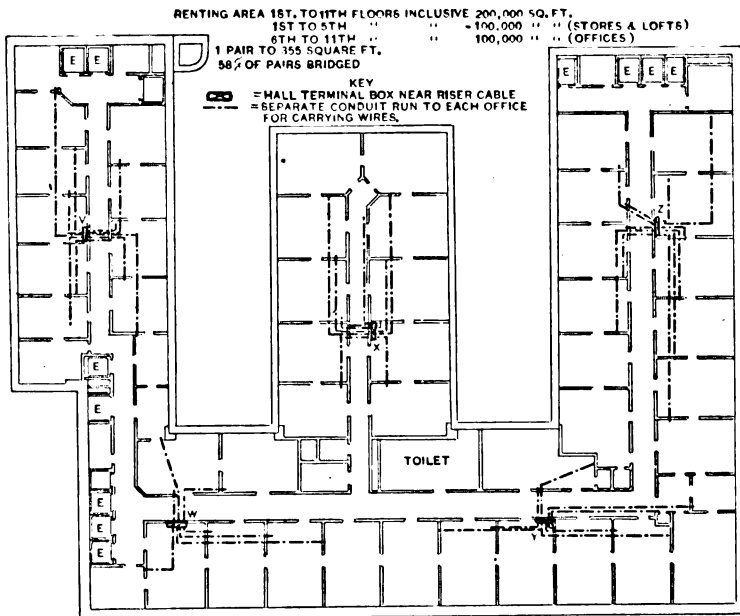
11-STORY OFFICE BUILDING, TYPICAL FLOOR PLAN.
